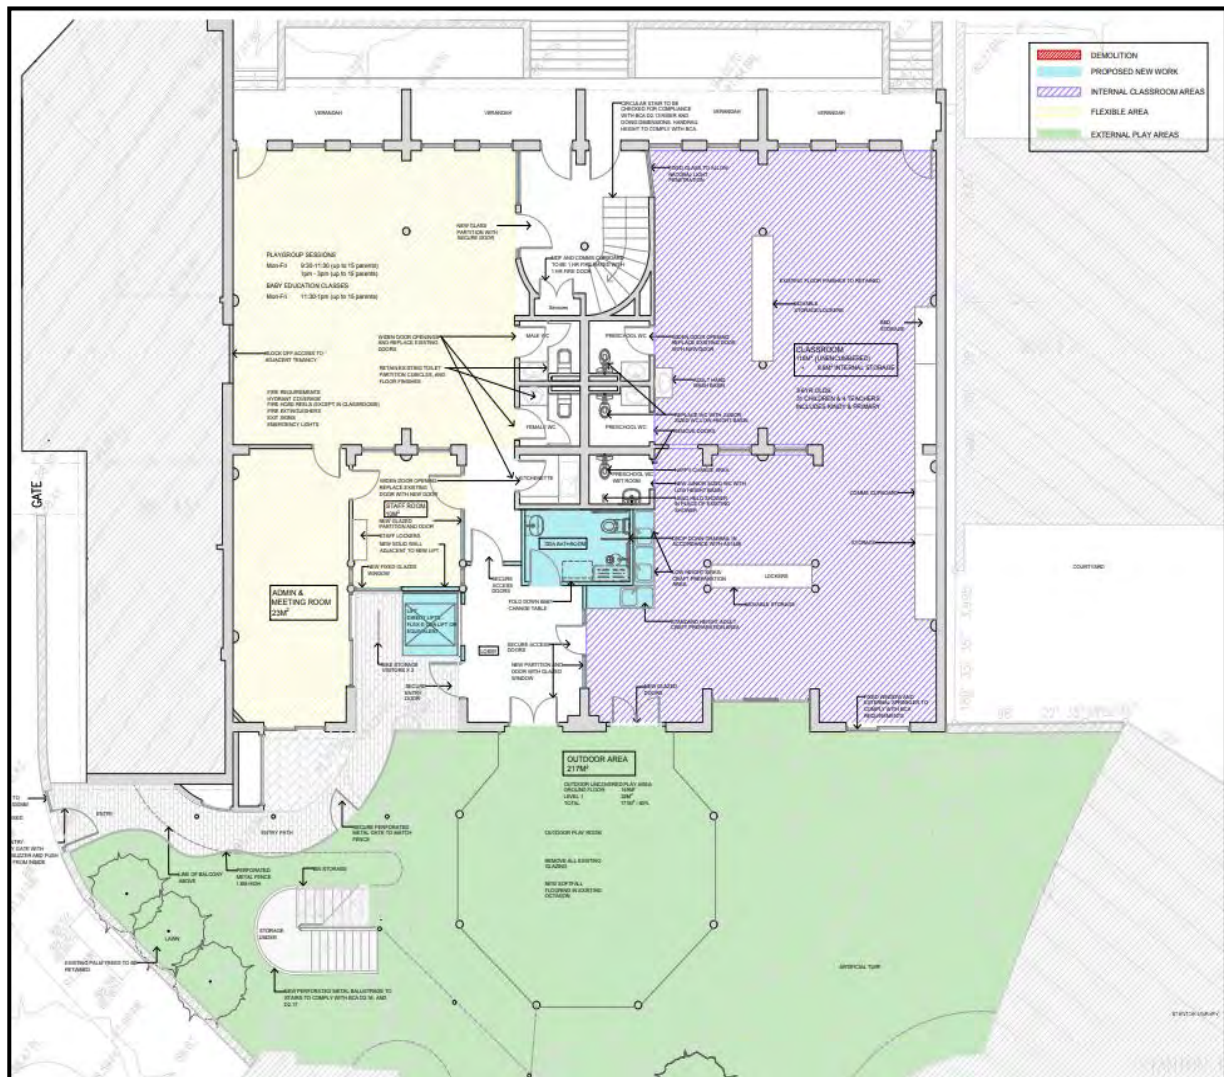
Proposed Amended Ground Floor Plan (Extract from Architectural Plan DA. 200 – Lucy Jackson Architect)
